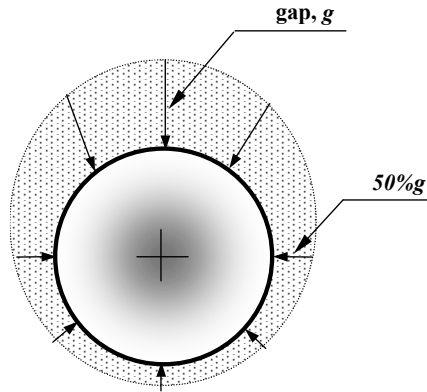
Oval-shape Ground Deformation Around Tunnel Section
